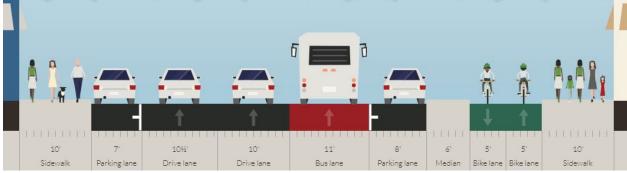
Typical Cross Section of Folsom Street between 5th Street and between 5th and 4th streets
